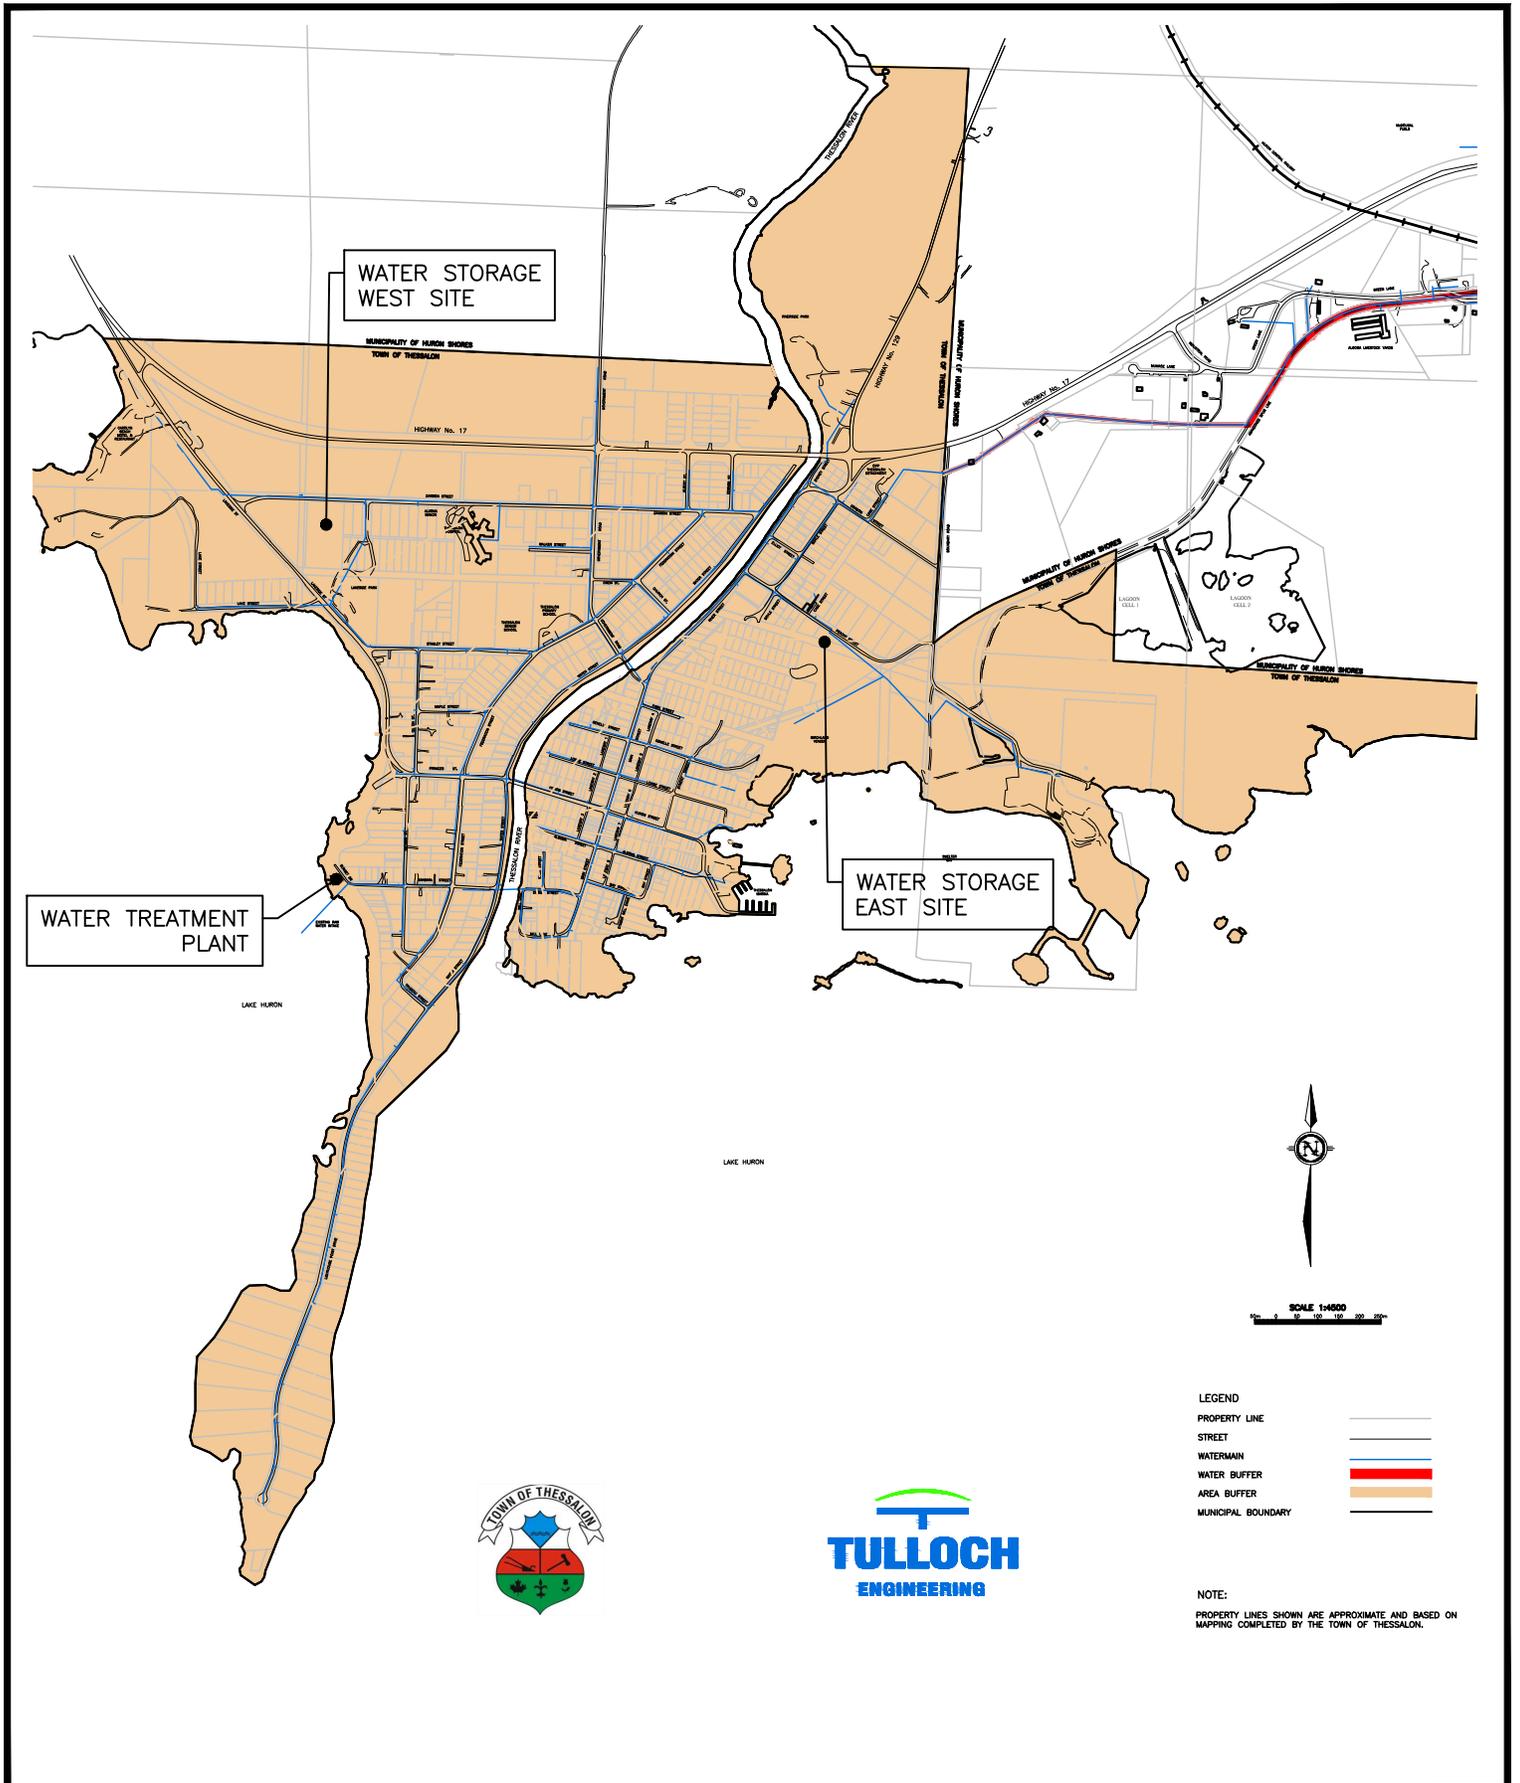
TOWN OF THESSALON WATER SYSTEM, ALTERNATIVE LOCATIONS FOR WATER STORAGE
